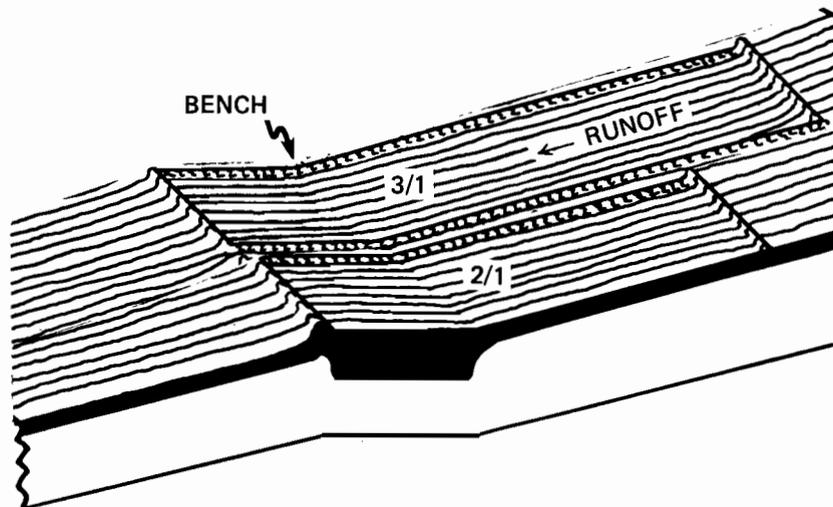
Layout of Zingg conservation terraces and profile of the system showing twice as much water storage in the level benches (22, 37).
